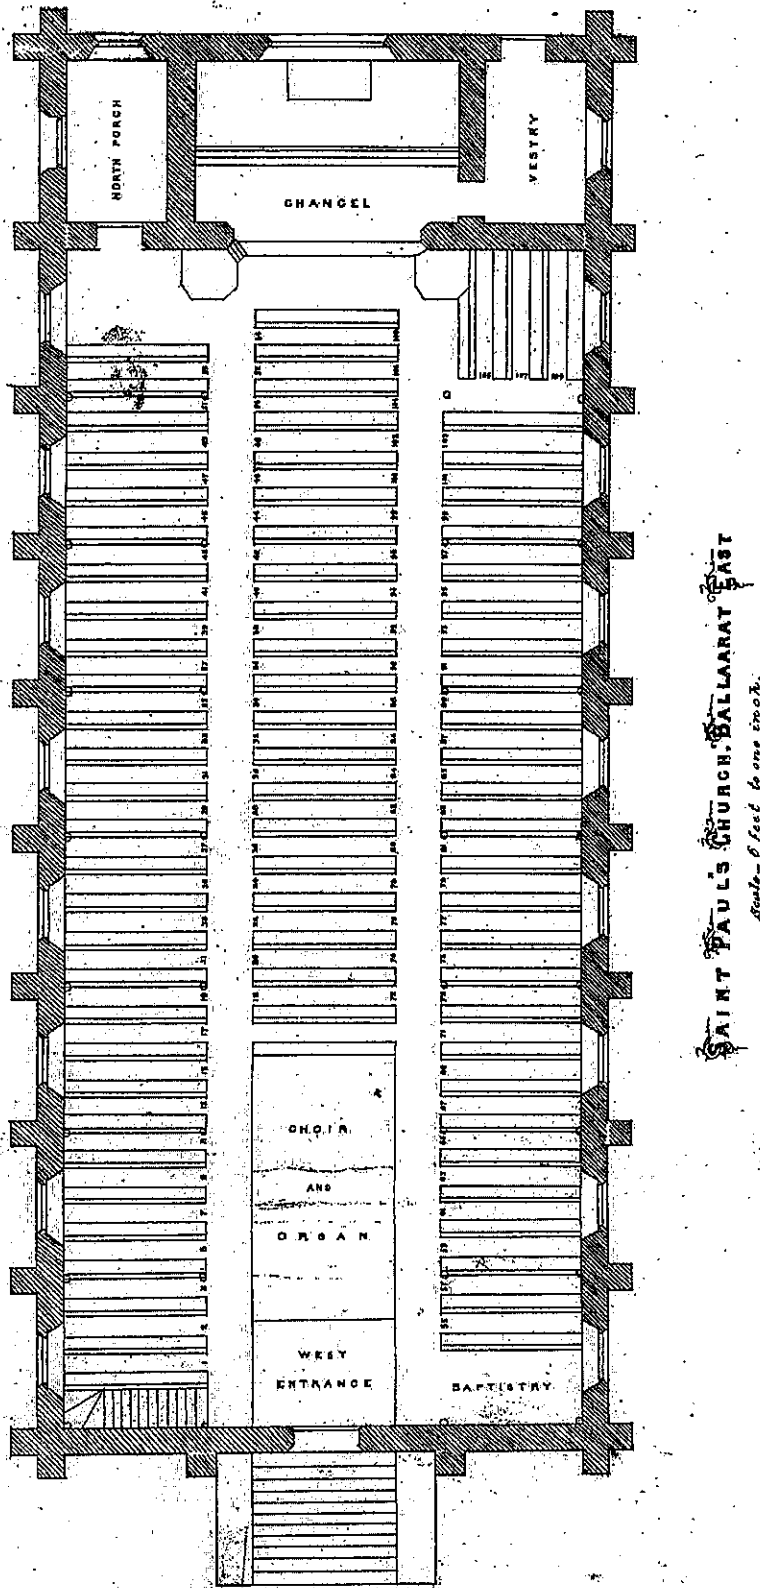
St. Paul's Church Floor Plan (19<sup>th</sup> century), showing the space in the centre rear of the building for the organ and choir. Source: St. Paul's Anglican Church.
